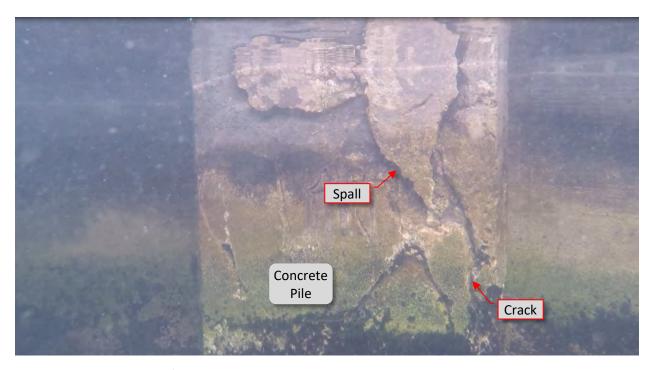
P11. STA 3+16. Crack/spall at east flange at pile. Underwater view.
